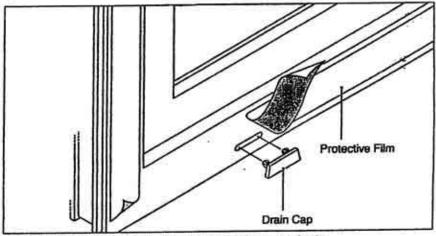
Remove the protective film and install the drain caps - exterior view
